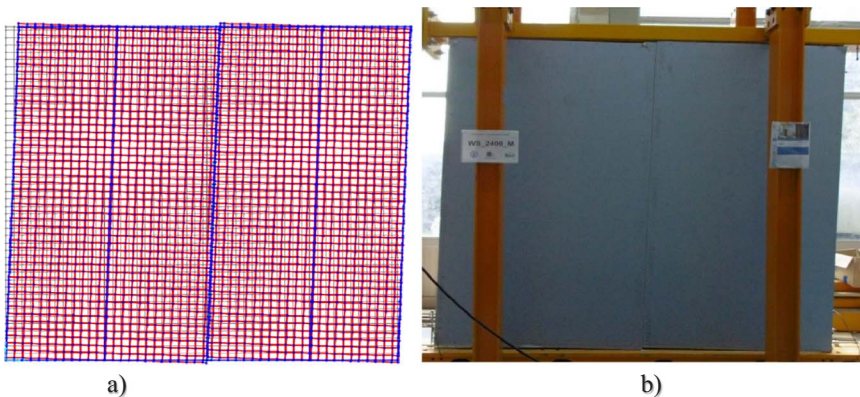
Deformed shape of short shear wall (WS_2400_M) a) finite element model b) monotonic tests.
